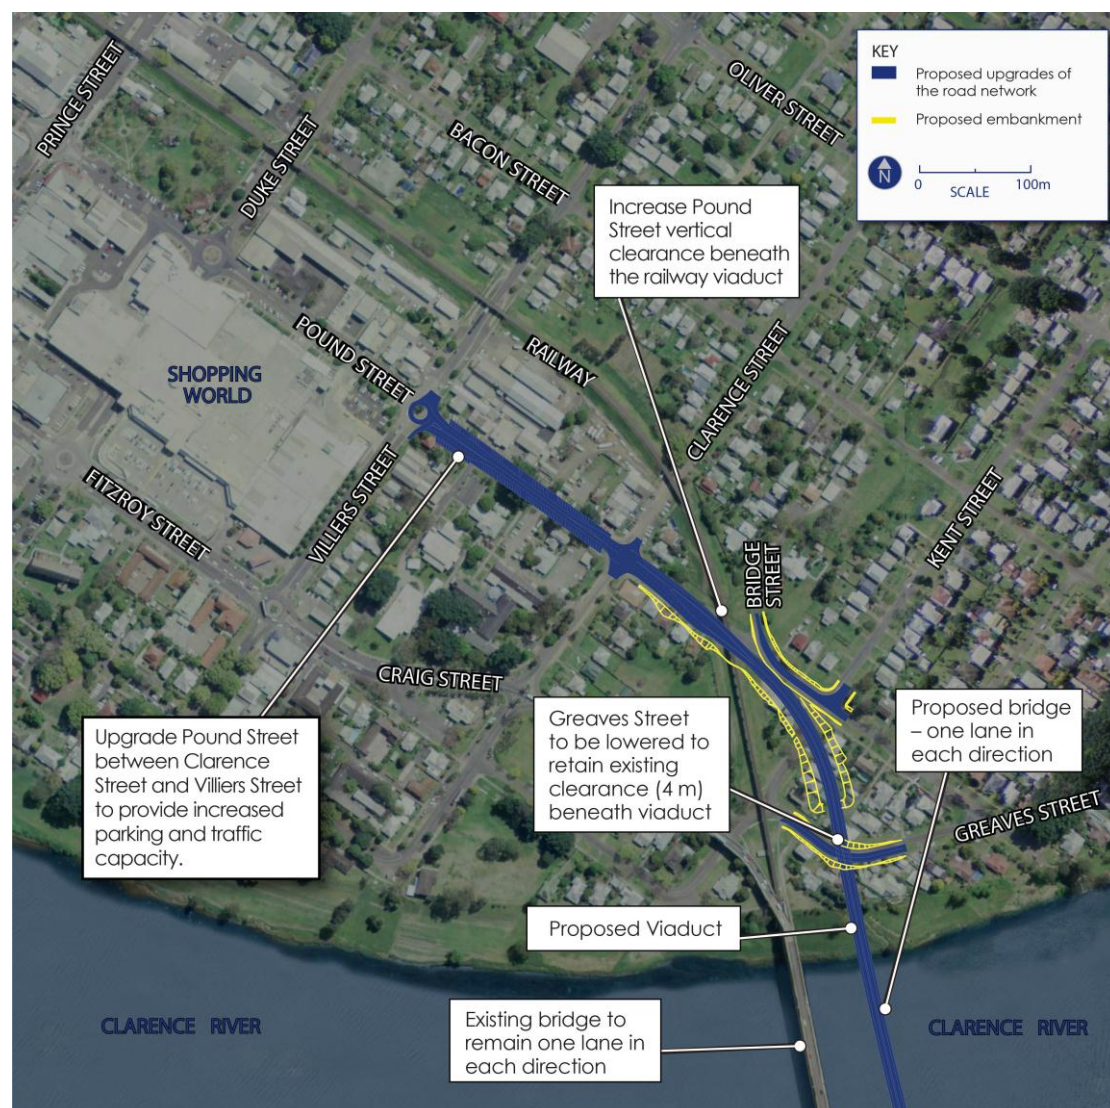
Proposed road network upgrades in Grafton (Note: project elements shown in this figure are subject to further refinement)
